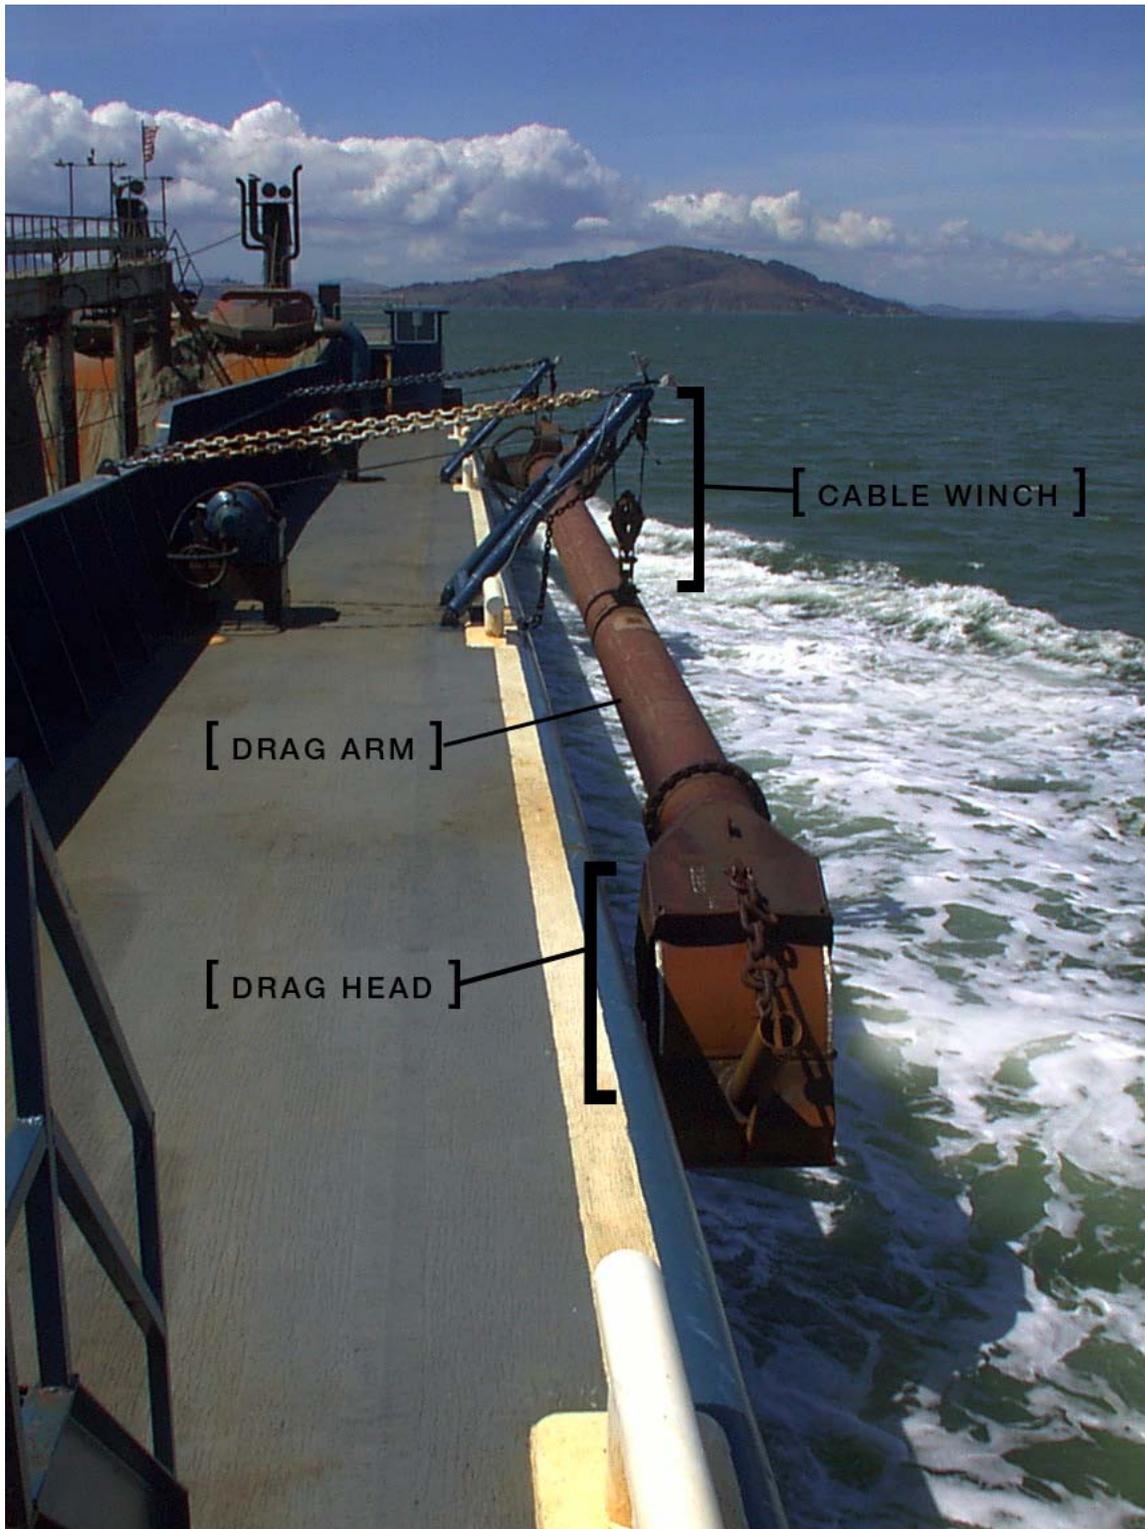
Hydraulic suction drag arm and drag head assembly in the retracted position
